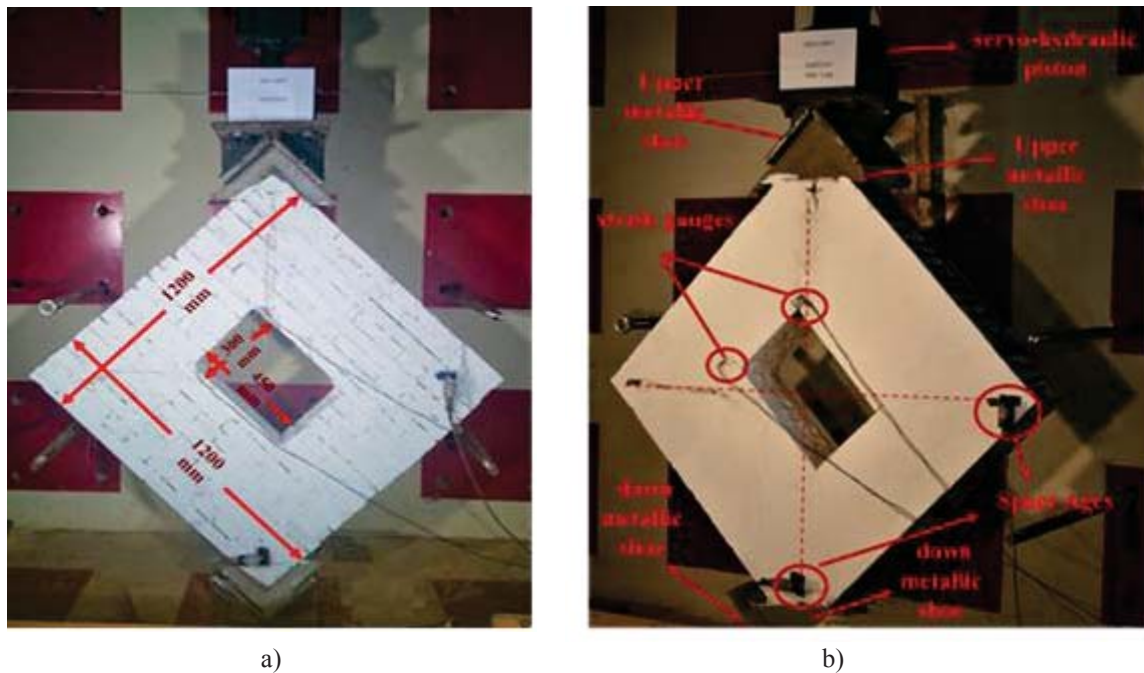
a) Experimental set up of solid brick URM wall with central opening, b) Arrangement of measuring instruments on the URM wall.
